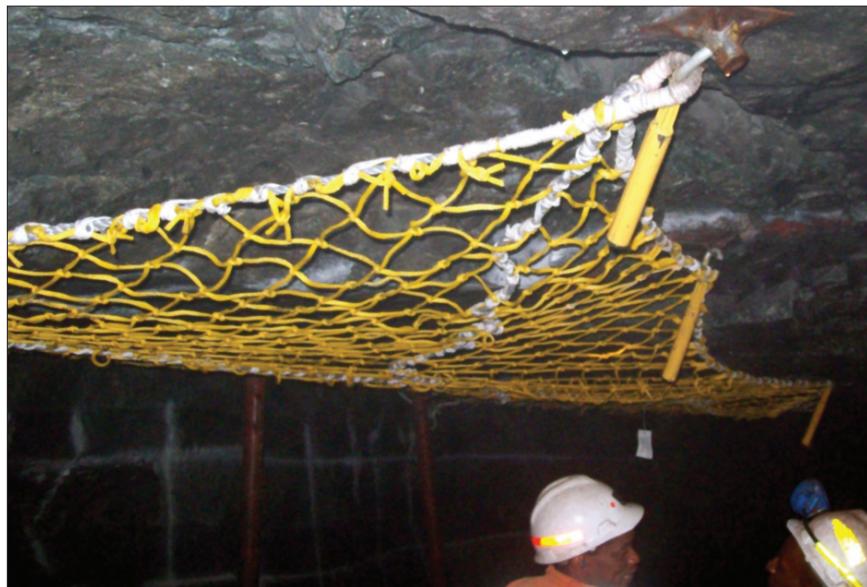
Typical stope hangingwall safety net installation showing the rear of the net suspended from rock anchor washers with 'Ezihook' C-hooks
